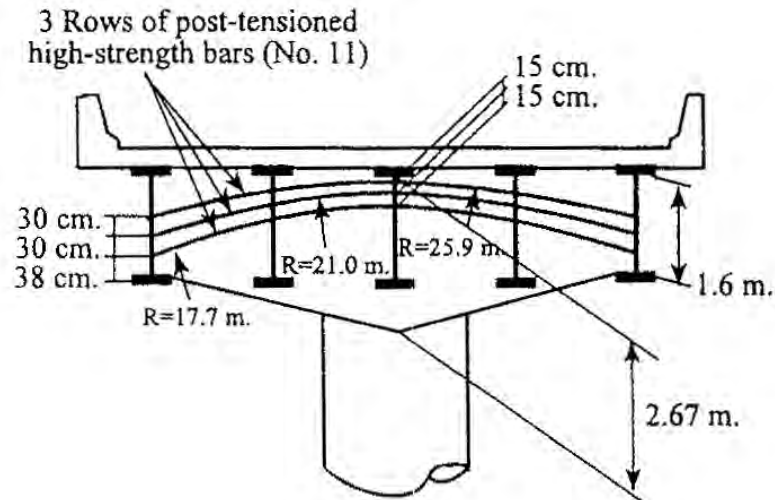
Location of post-tensioned bars in the pier cap.
